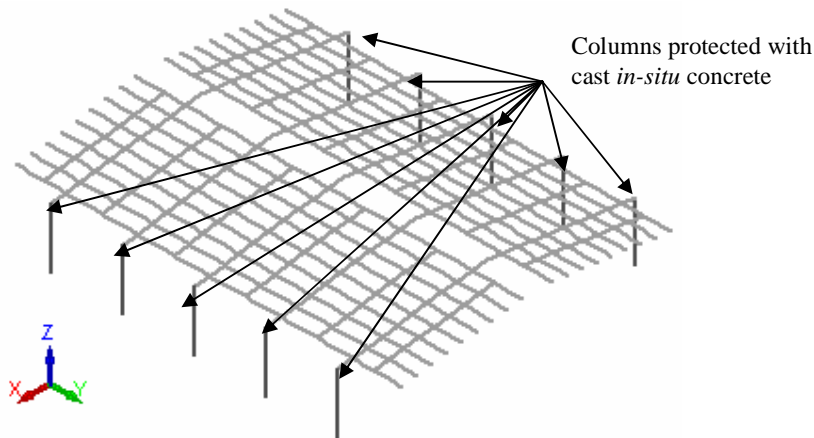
Steel columns protected with cast *in-situ* concrete
